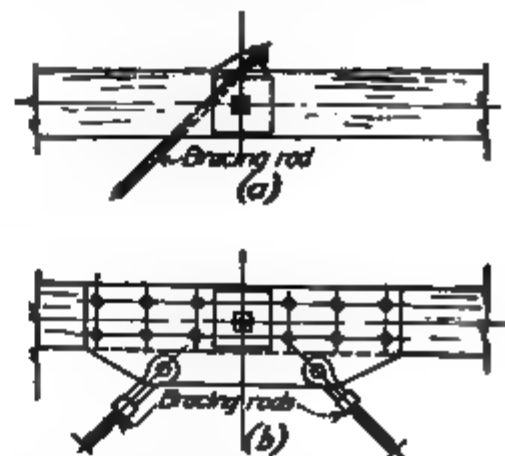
Typical details of connection of bracing rods to upper chord of roof truss.
